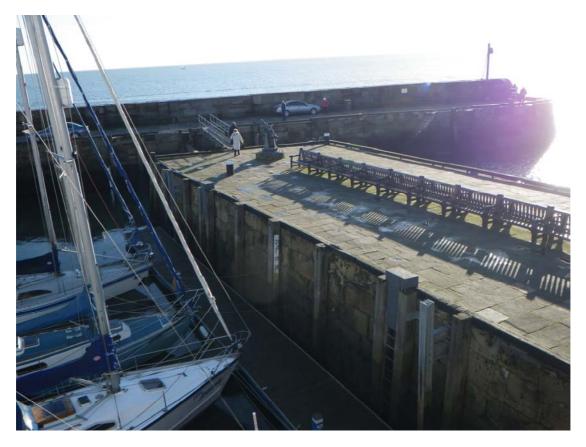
East Pier, south end, showing southern landing stair and temporary footbridge, looking south-east across end of Vincent's Pier
